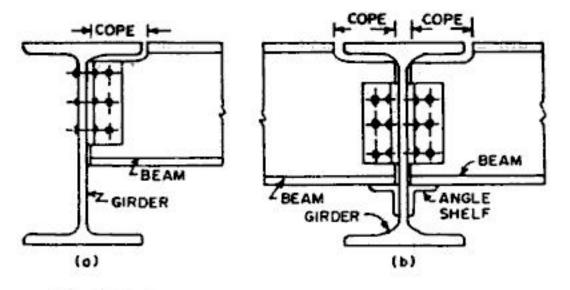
BEAM FRAMING AT THE SAME LEVEL
